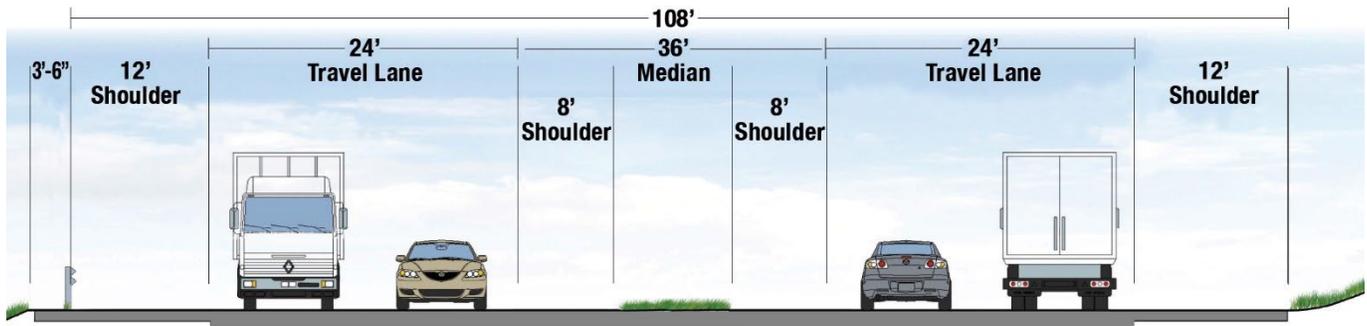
Build Alternative Typical Section (36-foot median, not to scale)
